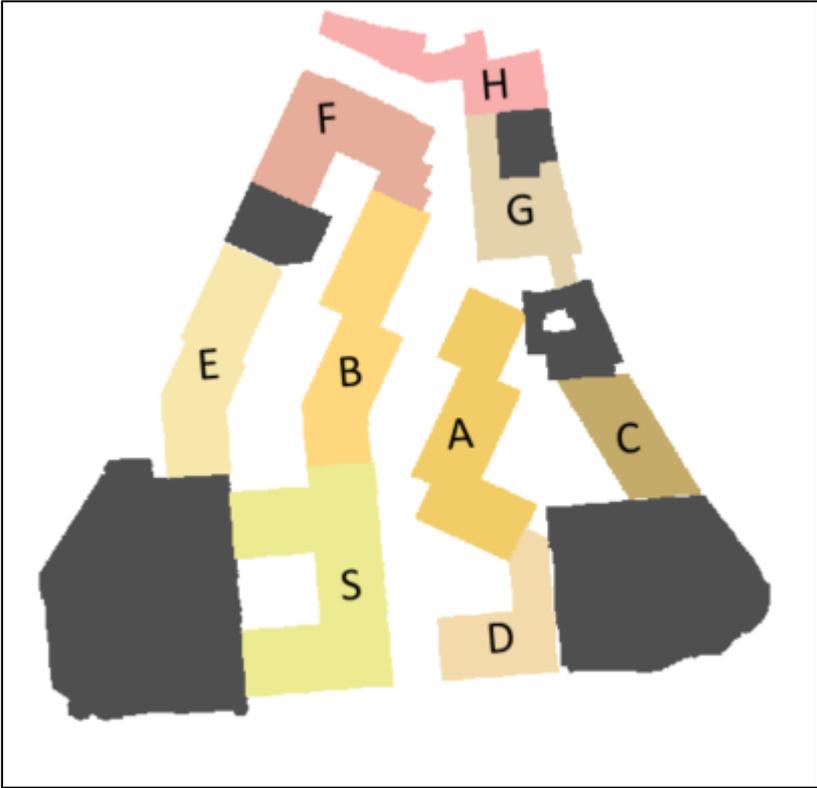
presents the proposed layout at first floor level, which provides some context in terms of residential use in proximity to surrounding licensed premises.
